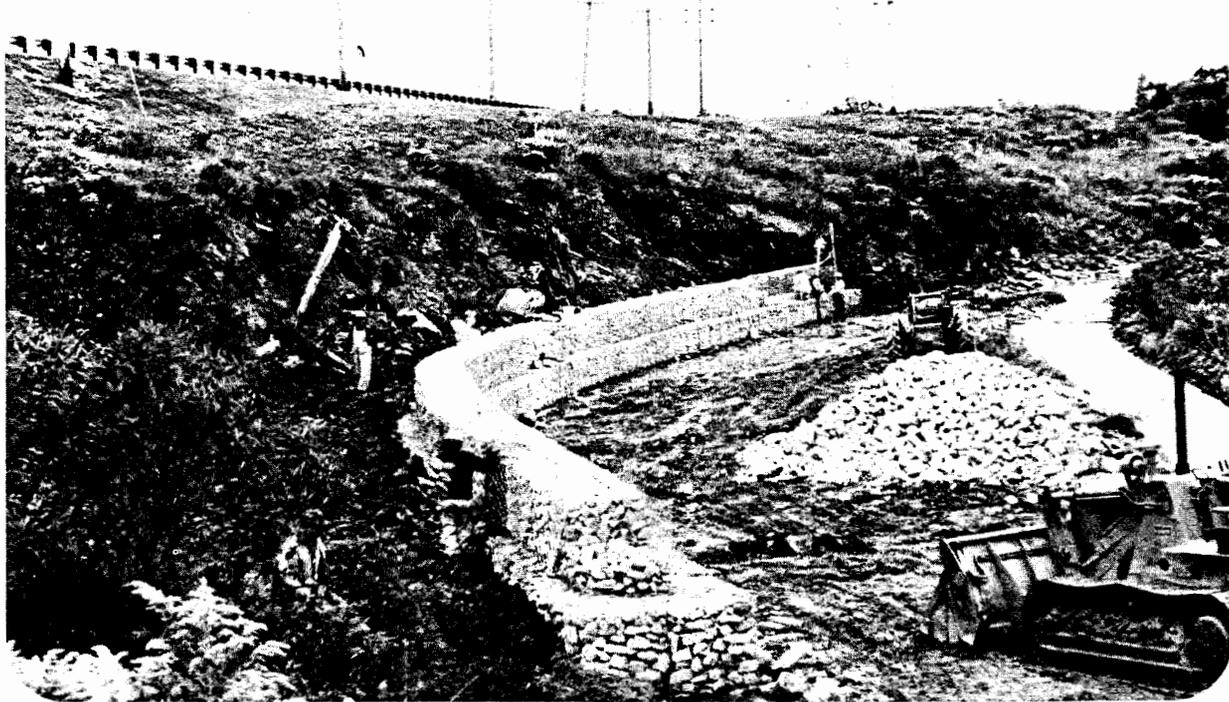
Bekaert Gabions being used to protect toe of embankment. Permeability of gabions prevents buildup of hydraulic pressure, stabilizes even the wettest slopes.
